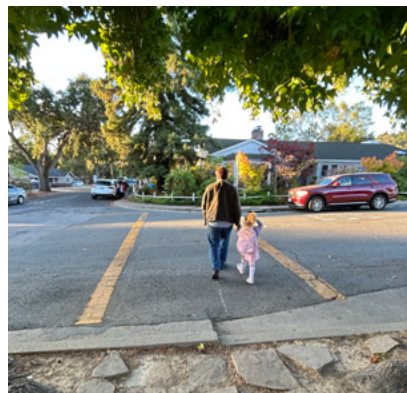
Pedestrians walking to school across the crosswalk at Eaton Ave and Clifford Ave without a curb ramp.
